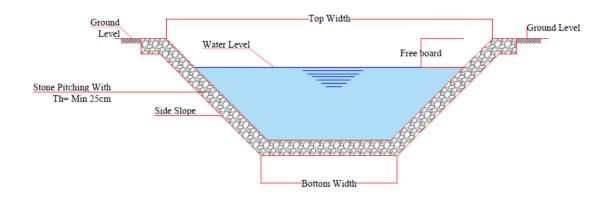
Typical Cross-Section for a Grouted stonepitching Lined Channel (Bed and Sides) Concrete open channels should be provided with weep holes in locations where they are below ground water table. These weep walls are small openings designed to bleed off excess moisture collected behind the walls of drainage channels. They allow relief of hydrostatic pressure water exerted by the groundwater on the walls by allowing trapped groundwater to escape. These weep holes should have a minimum diameter to permit free drainage, with an adequate spacing between weep holes to allow uniform drainage from behind the wall. Weep holes should always have a filter material between the wall and the backfill to prevent migration of fine material and loss of backfill. Maintenance of these weep holes are highly necessary to overcome clogging caused by weeds and vegetation.
